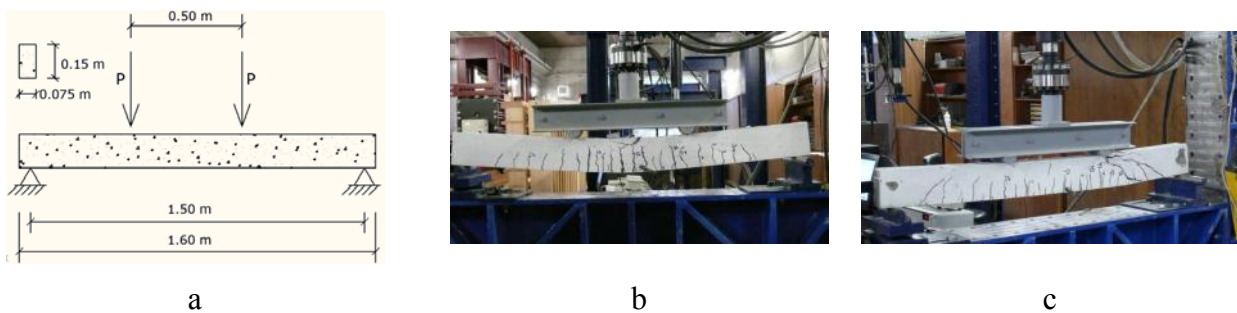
a) Scheme of developed laboratory tests; b) Bending failure mode; c) Shear failure mode
